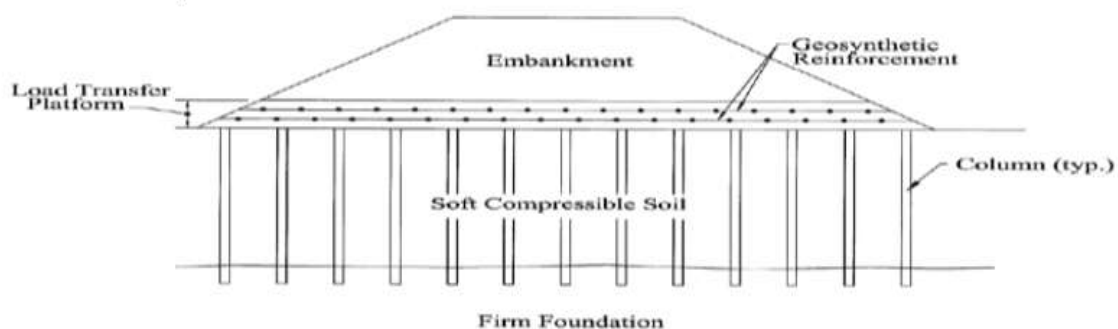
Schematic Sketch of a Load Transfer Platform
